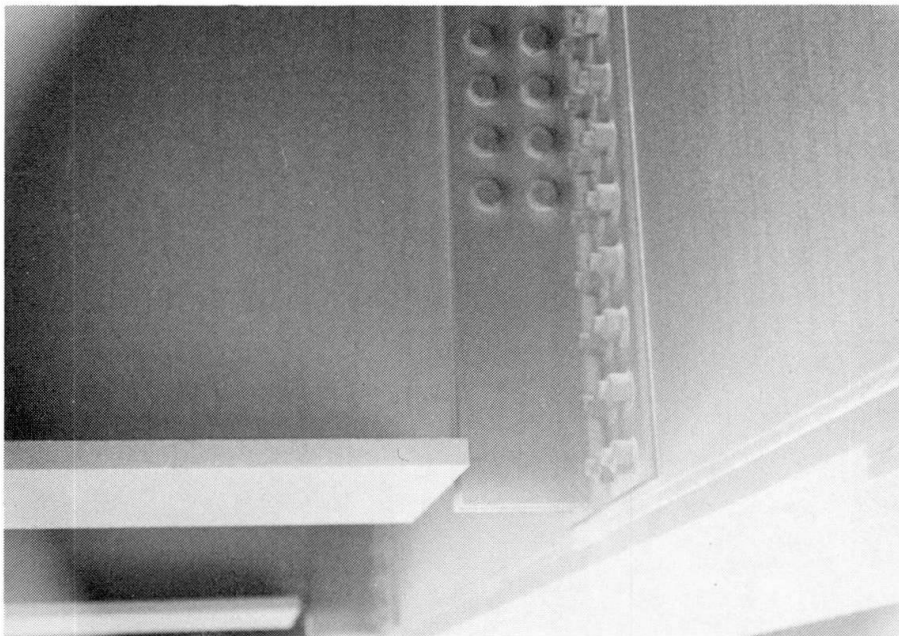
Longitudinal Girder Not Bolted Full Depth to the Connection Angles
